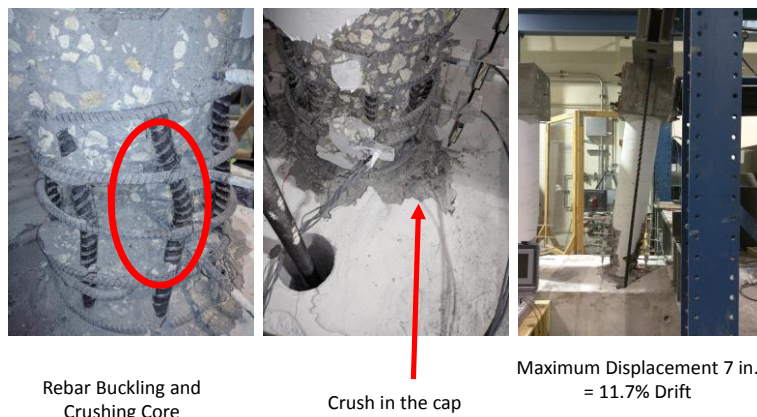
Failure pattern, rebar backing, crushing core concrete and location of the plastic hinge in the S-6-R.
